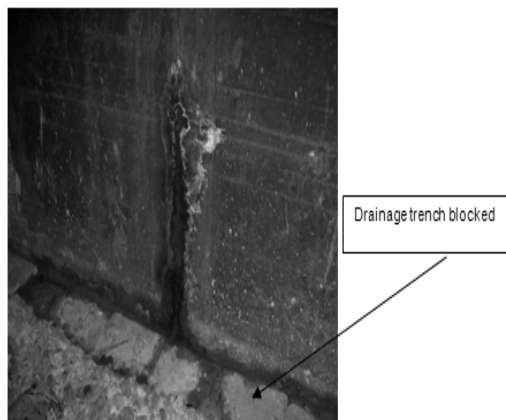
water leaking from the slit in the wall and clogged drainage ditch in Alsafkon tunnel.
